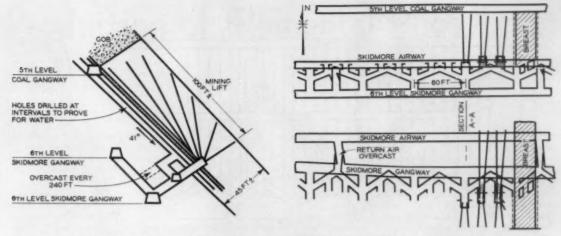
Longitudinal section looking north and horizontal plan (upper right) at Lansford colliery. Present longhole drill method of mining in the 6th level of No. 6 mine is shown in cross section A-A looking north.
